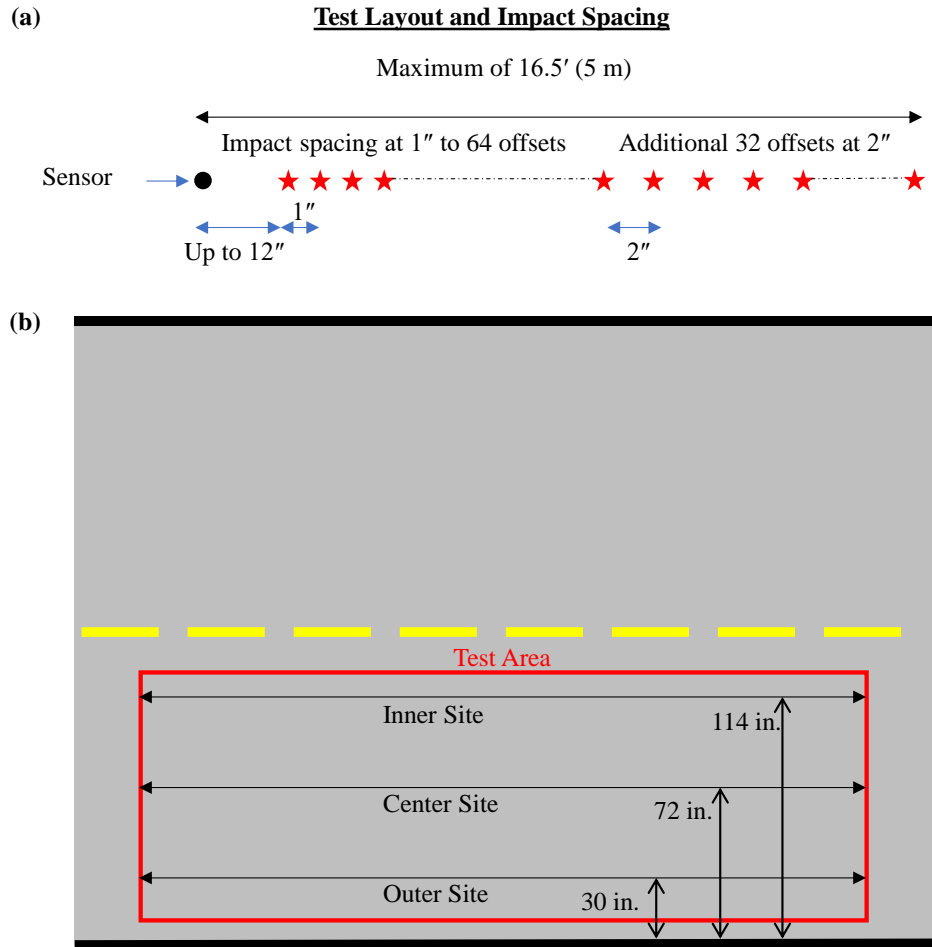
Test site layout for surface wave testing; (a) spacing of impacts at test location and (b) road schematic with typical test locations in a lane.
